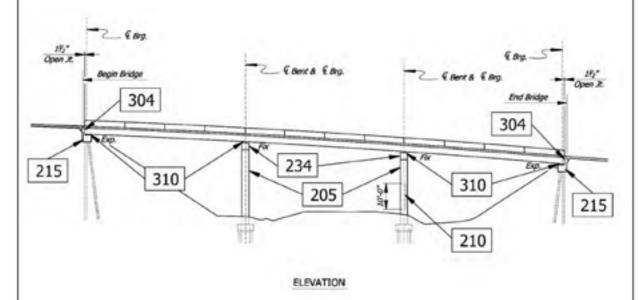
Bridge elevation view from construction plans for a three-span steel beam bridge. (Source: Alabama DOT)
